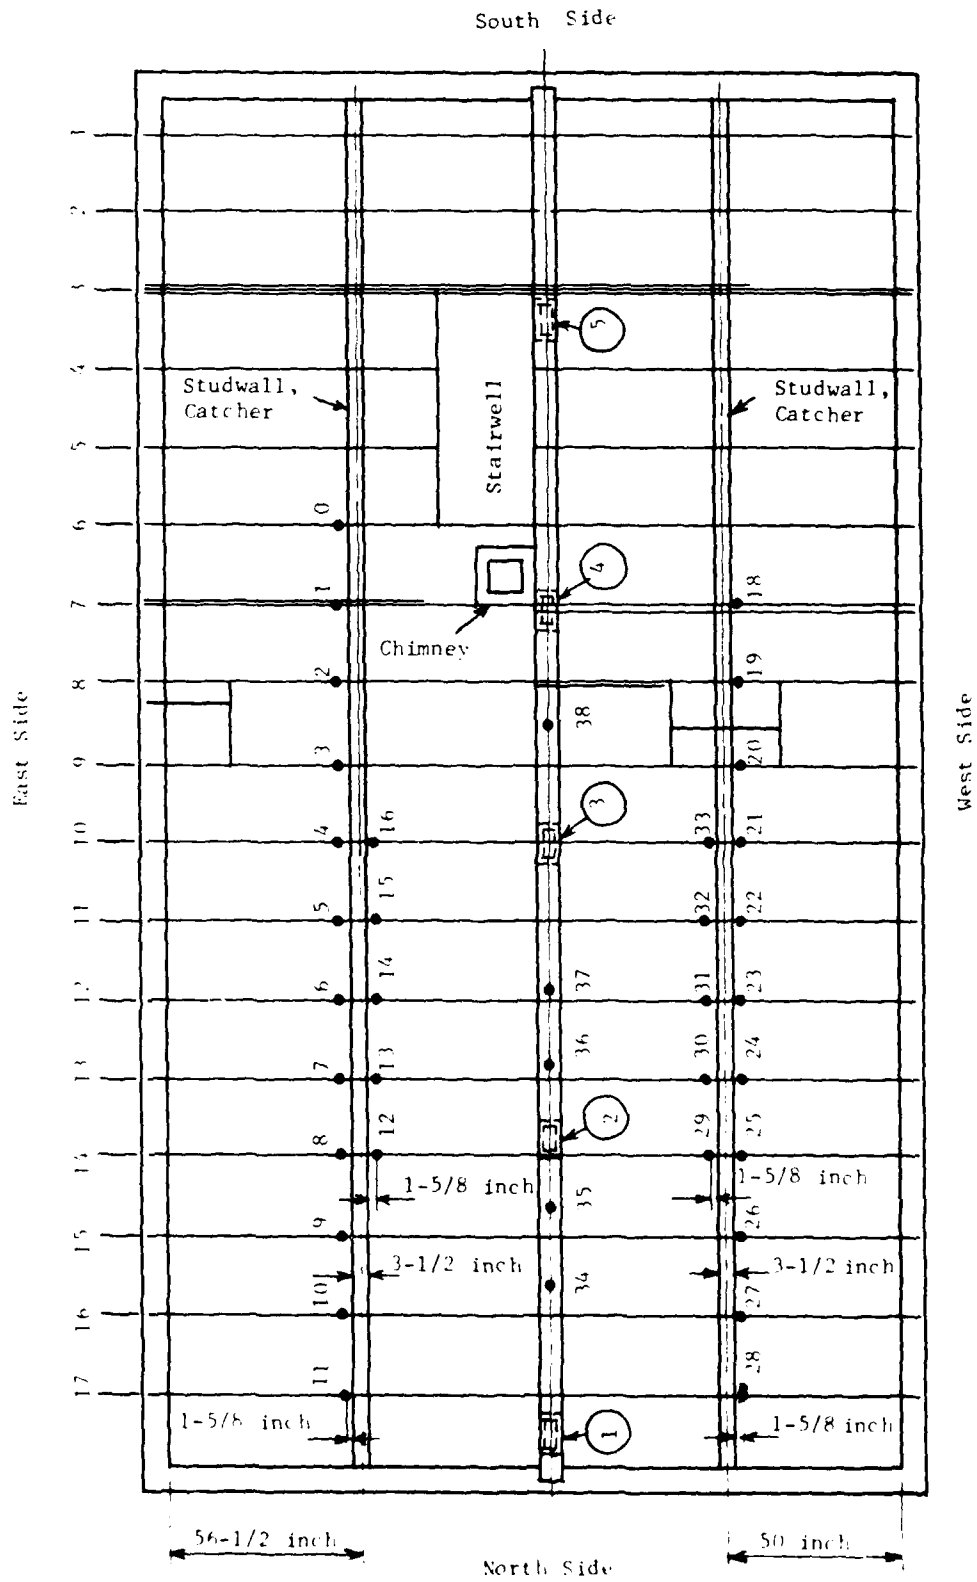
Deflection Measurement Instrumentation Layout, First Load Test
